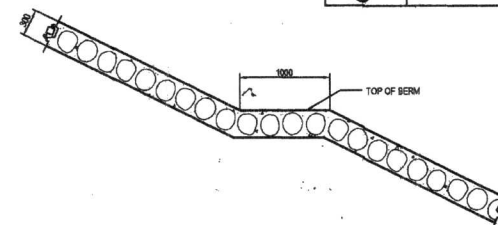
DETAIL OF CUT-OFF WALL WITH CURTAIN WALL
